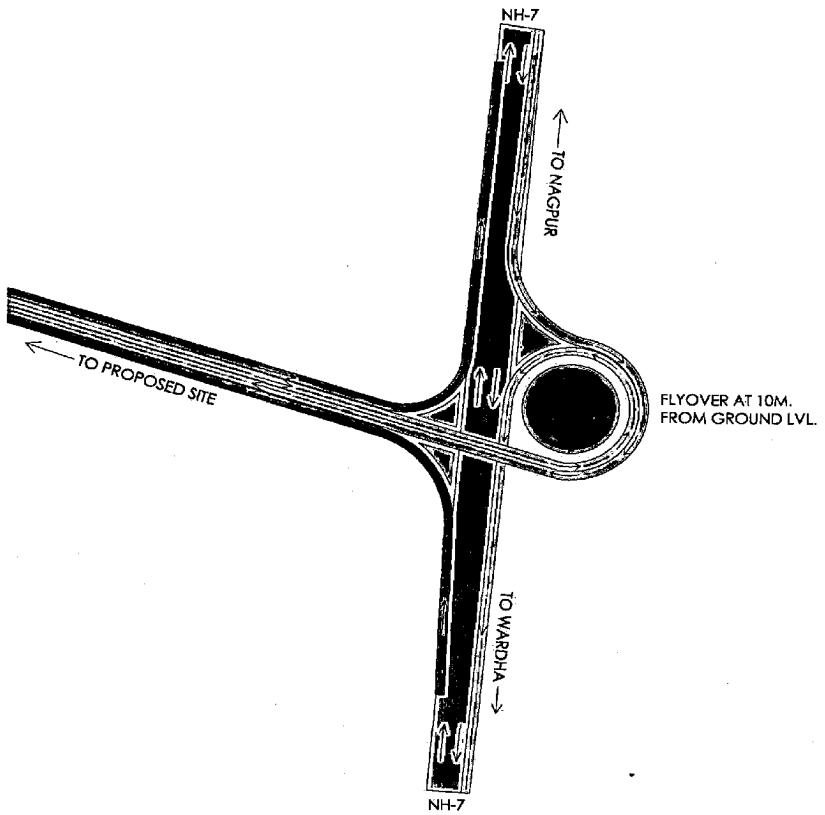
Plan of Fly-over connecting SEZ and NH-7
